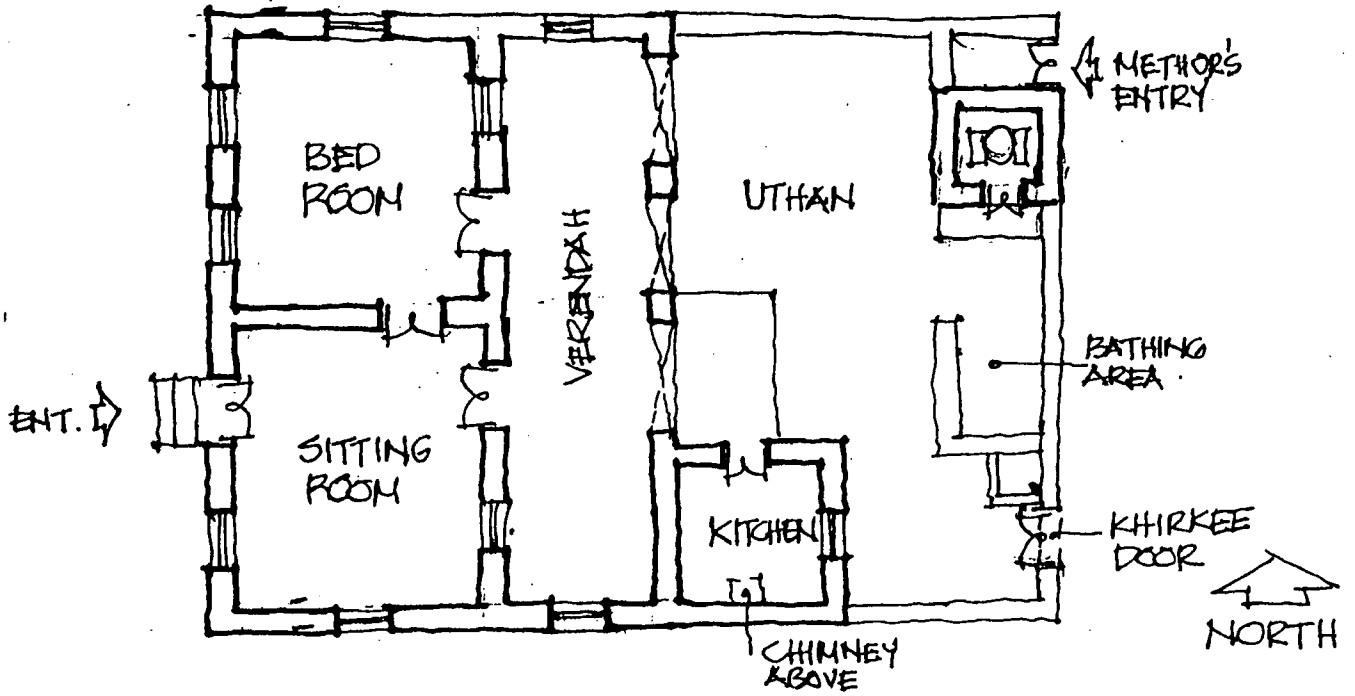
Ground floor plan, Booking clerks bungalow, Natore
